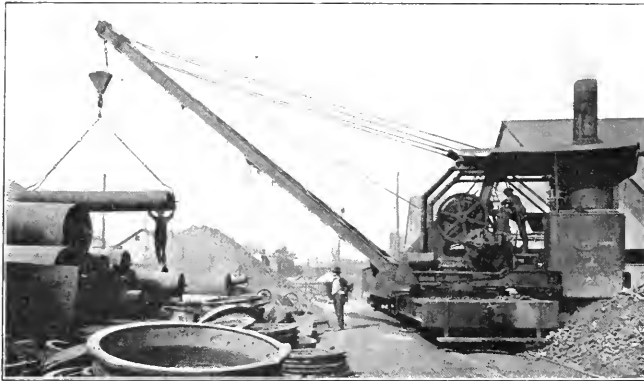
LOCOMOTIVE CRANE MOVING PIPE-MAKING EQUIPMENT
